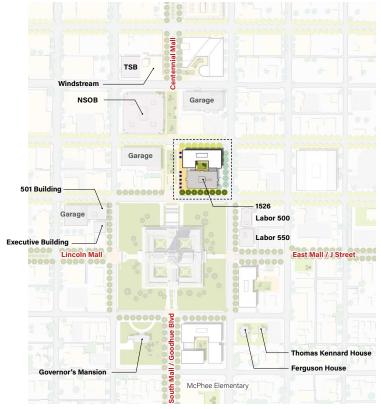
Illustrative view showing 1526 New Office Building Addition
